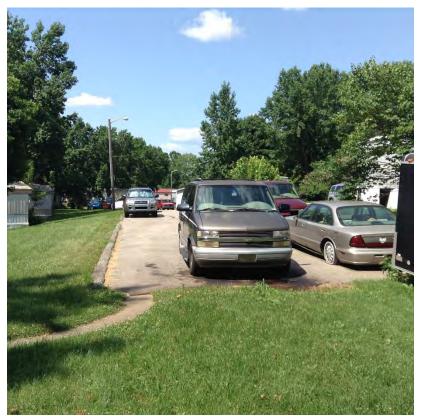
View facing north from Southcrest mobile home park. View of where future sidewalk would connect to proposed subdivision. Existing road stub not proposed to be extended.
